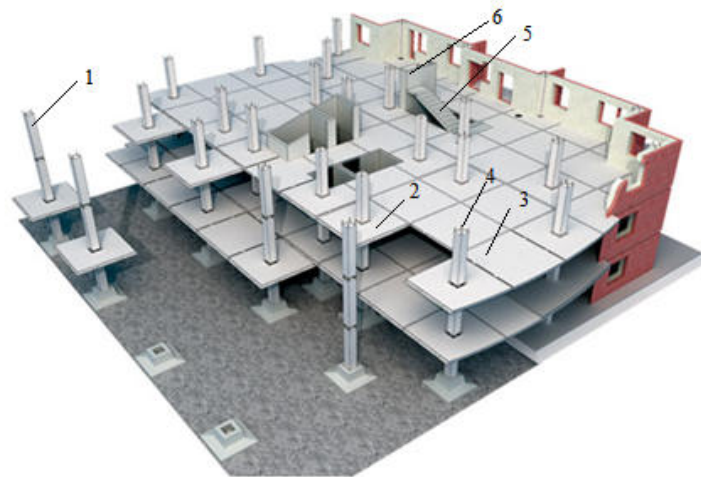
Scheme of Uncapital Ungirder Frame Structure for residential building:
